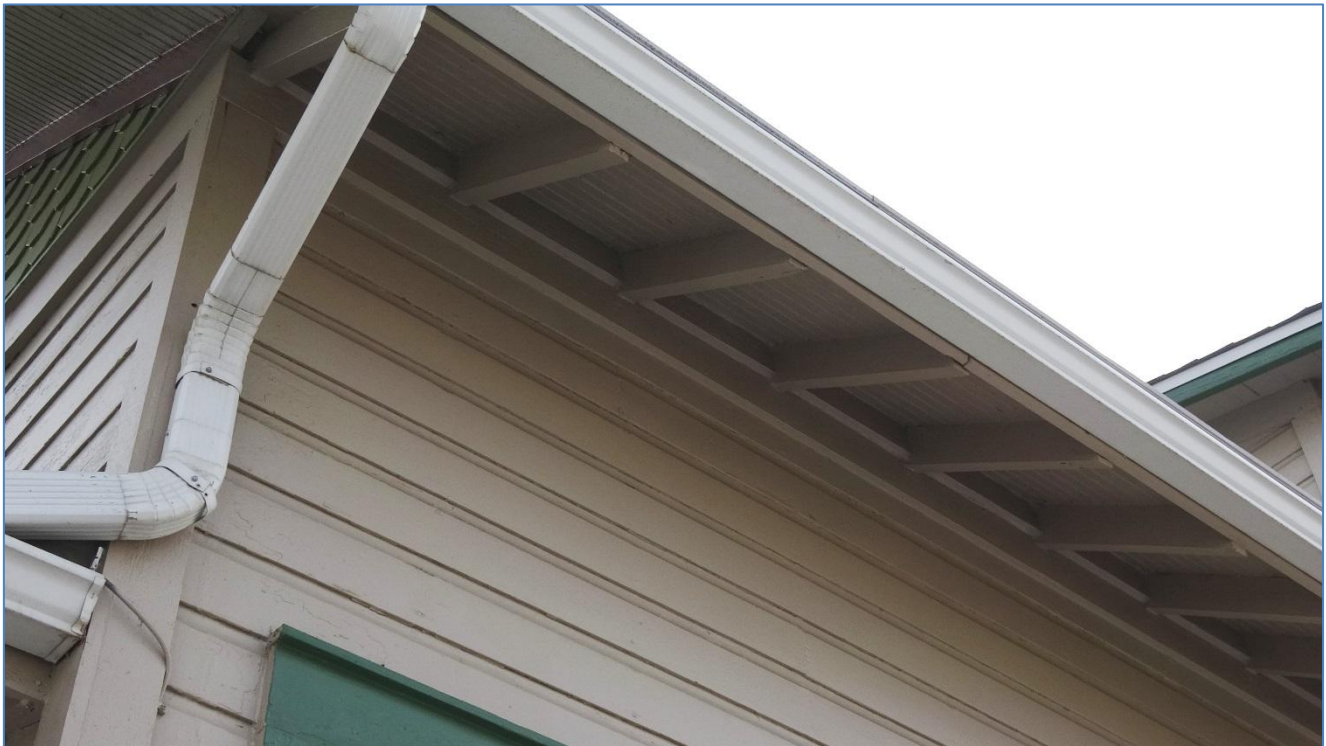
North elevation (at NE corner), overhanging eave detail. Note modestly exposed rafters. Photo: Drake Brownfield, 2017
